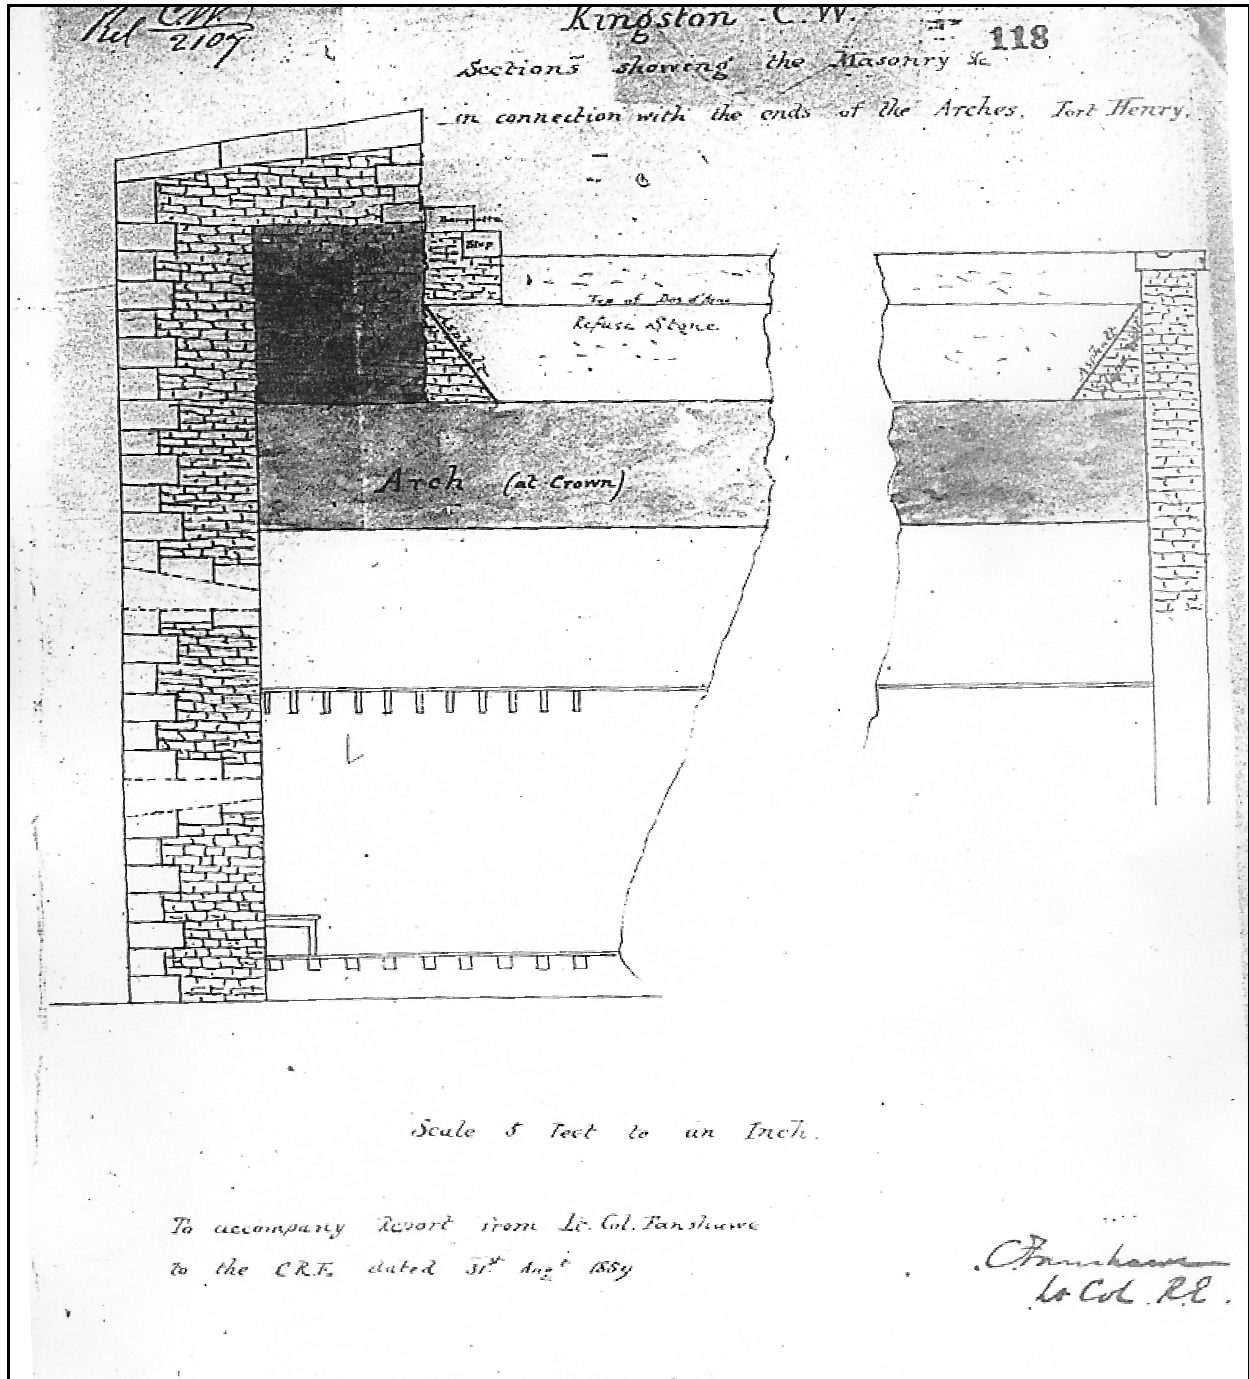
Sections showing the construction of the north casemates. NA, RG8, Vol. 1610, p. 118, Fanshawe to Servante, 31 August 1859. The words “Dry Masonry” are printed in the dark area immediately under the parapet.
